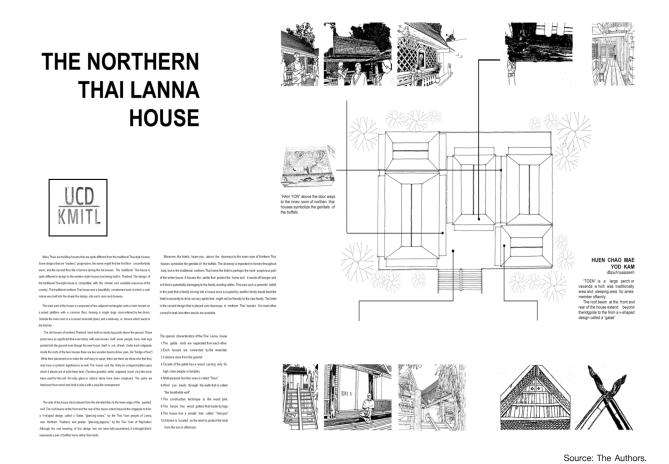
Analytical Sketches, Drawings, and Diagram of Typical Lanna Residences.
